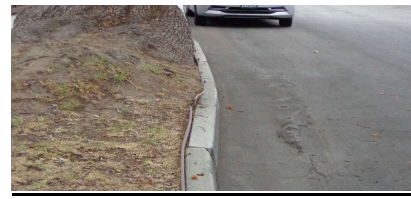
506 Arena Street uneven sidewalk and ponding due to tree root uplift
